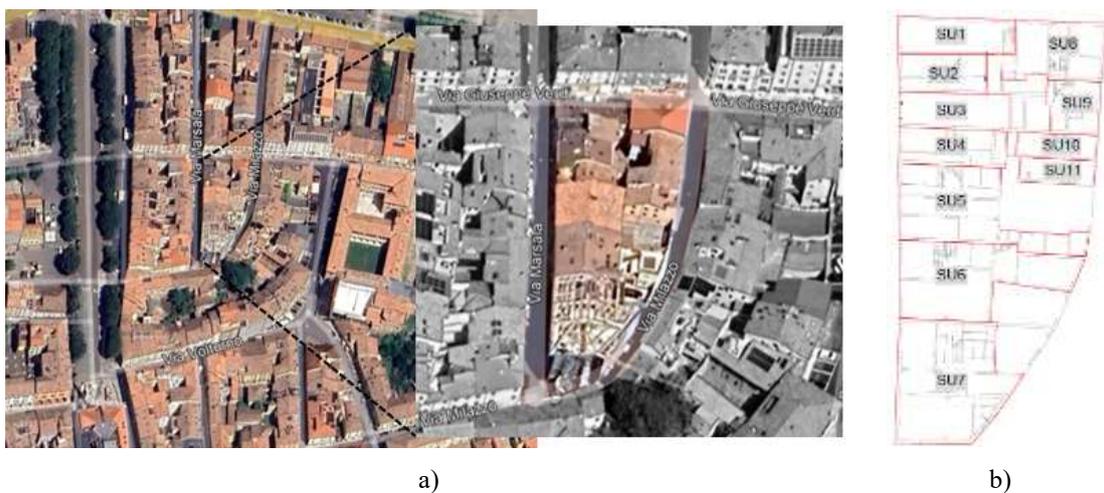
a) Location and geometry of the building aggregate under evaluation; b) Ground floor layout and identification of the eleven structural units.
